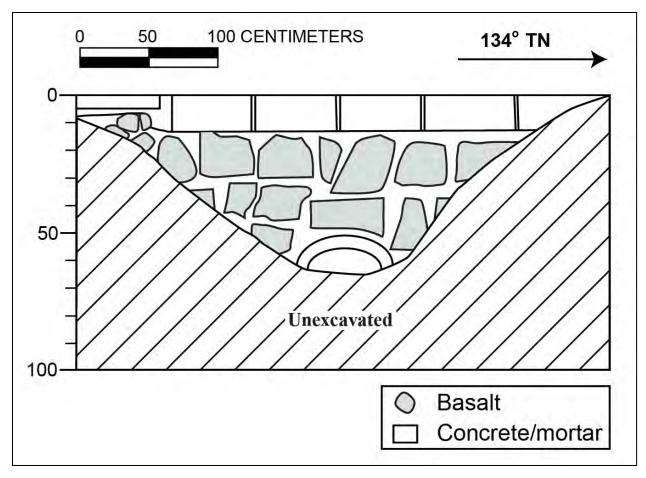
SIHP # 50-80-09-2268 Feature E southwest face of culvert profile
